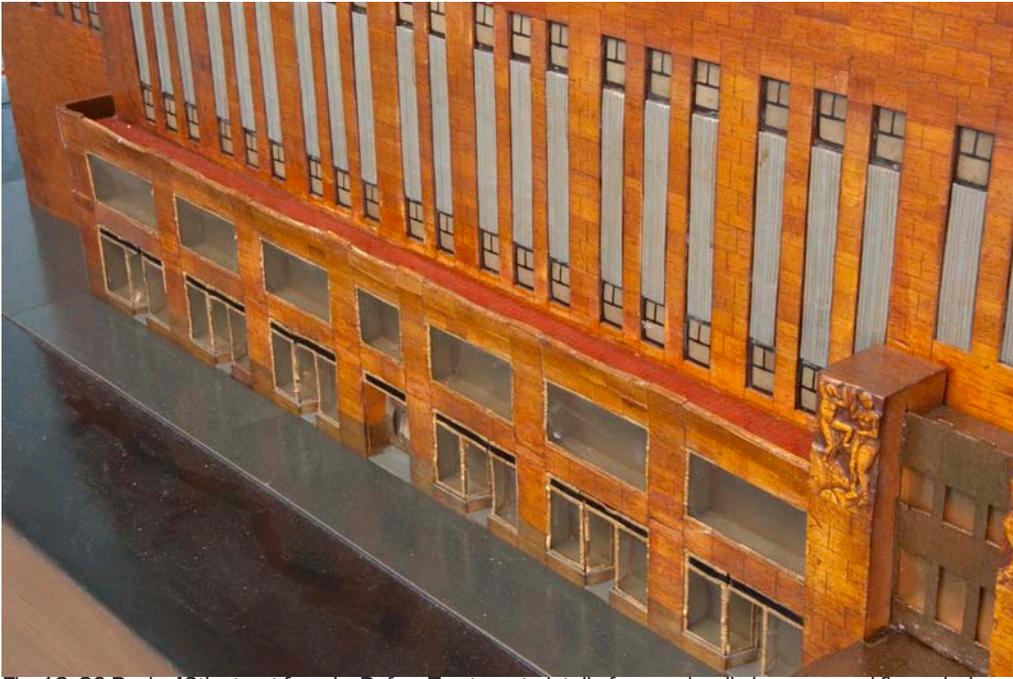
30 Rock, 49th street façade, Before Treatment, detail of warped wall above second floor windows.
